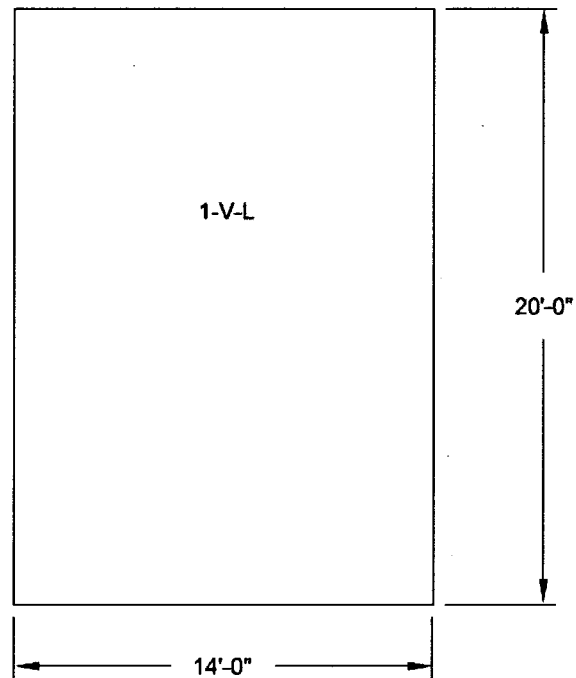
H.6-178 Wall 10 Looking From Outside
